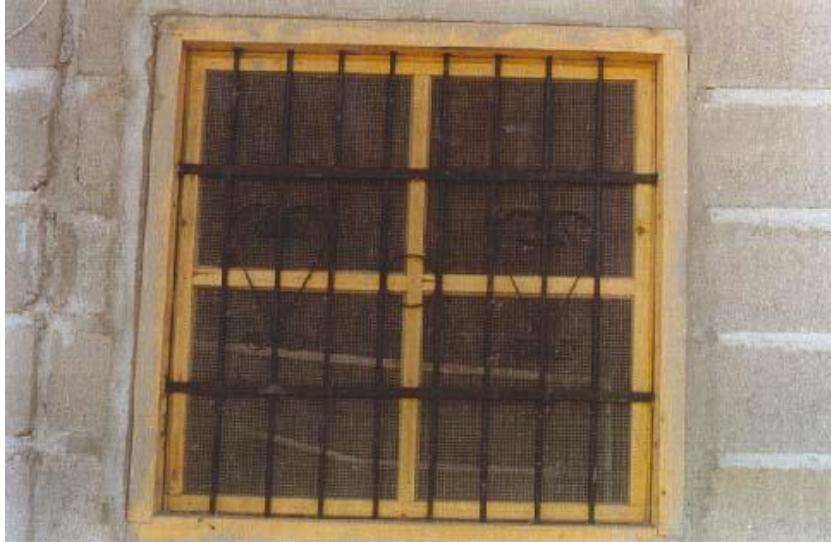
Encouraging Local Production: Concrete Blocks Were Locally Produced/Purchased Thereby Generating Employment
